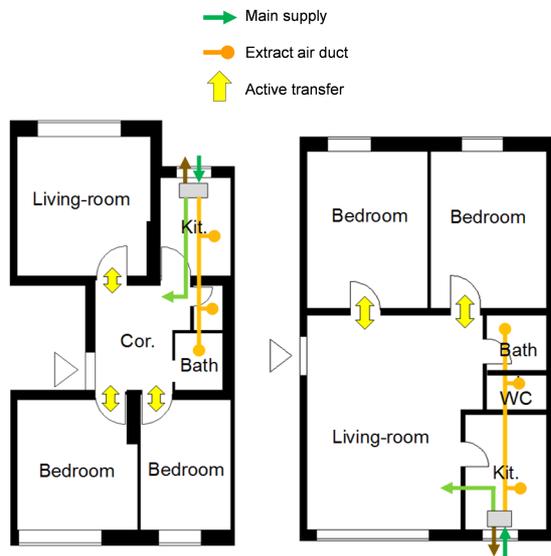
Floor-plans retained for the simulations. Left: with insulated living-room and corridor as mixed air zone. Right: “open” floor-plan with living-room as mixed air zone.
